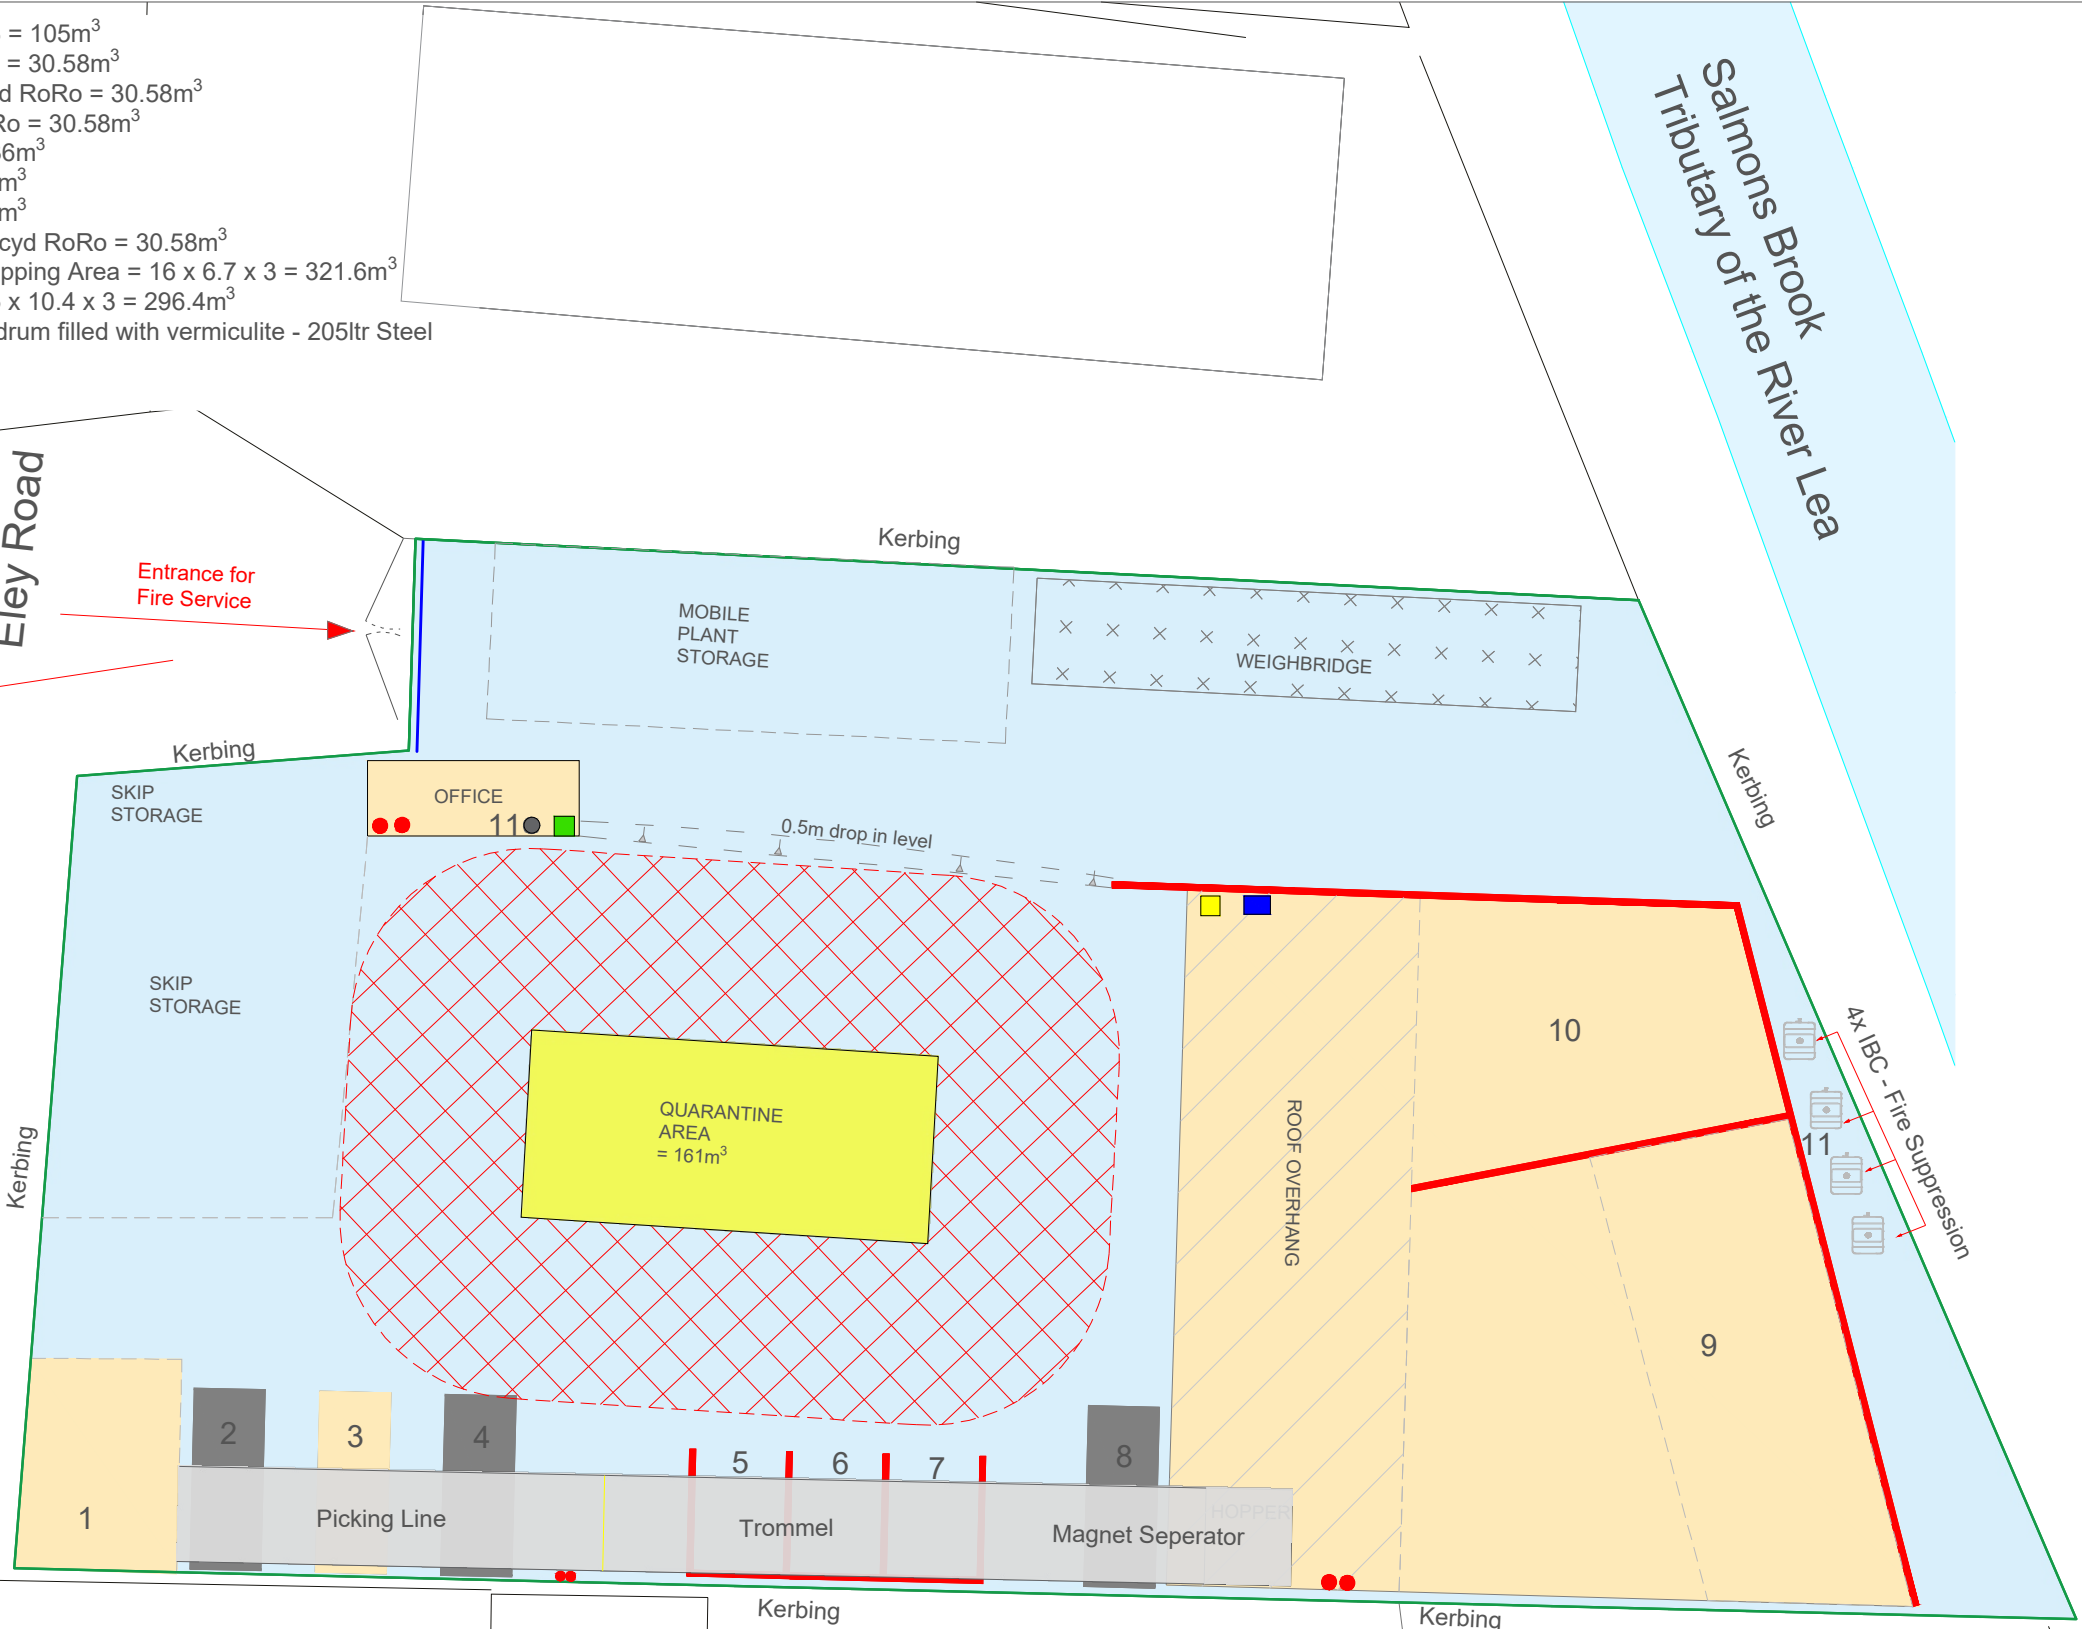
Site Layout Plan showing the destinations of the onsite processes
